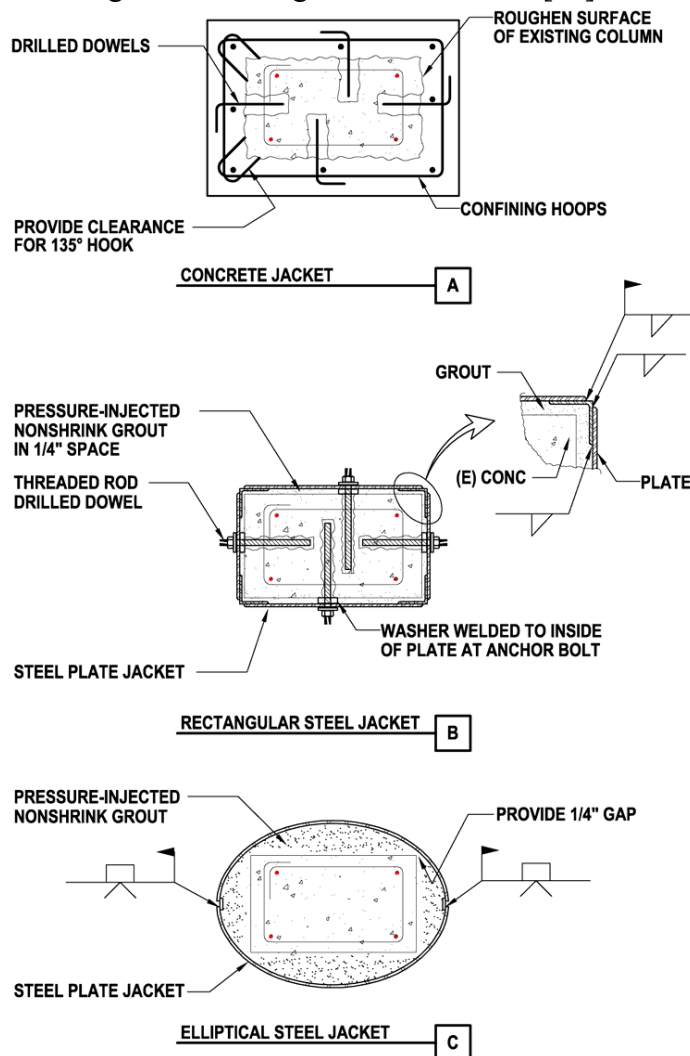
Schematic illustration of RC element strengthened with different method, Concrete and steel jacketing of columns [35] and USA practice, cited in [19]
